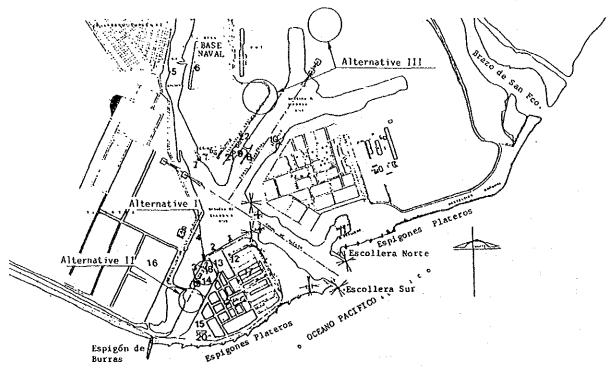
Alternative Site for Container Terminal (Port of Lazaro Cardenas)
